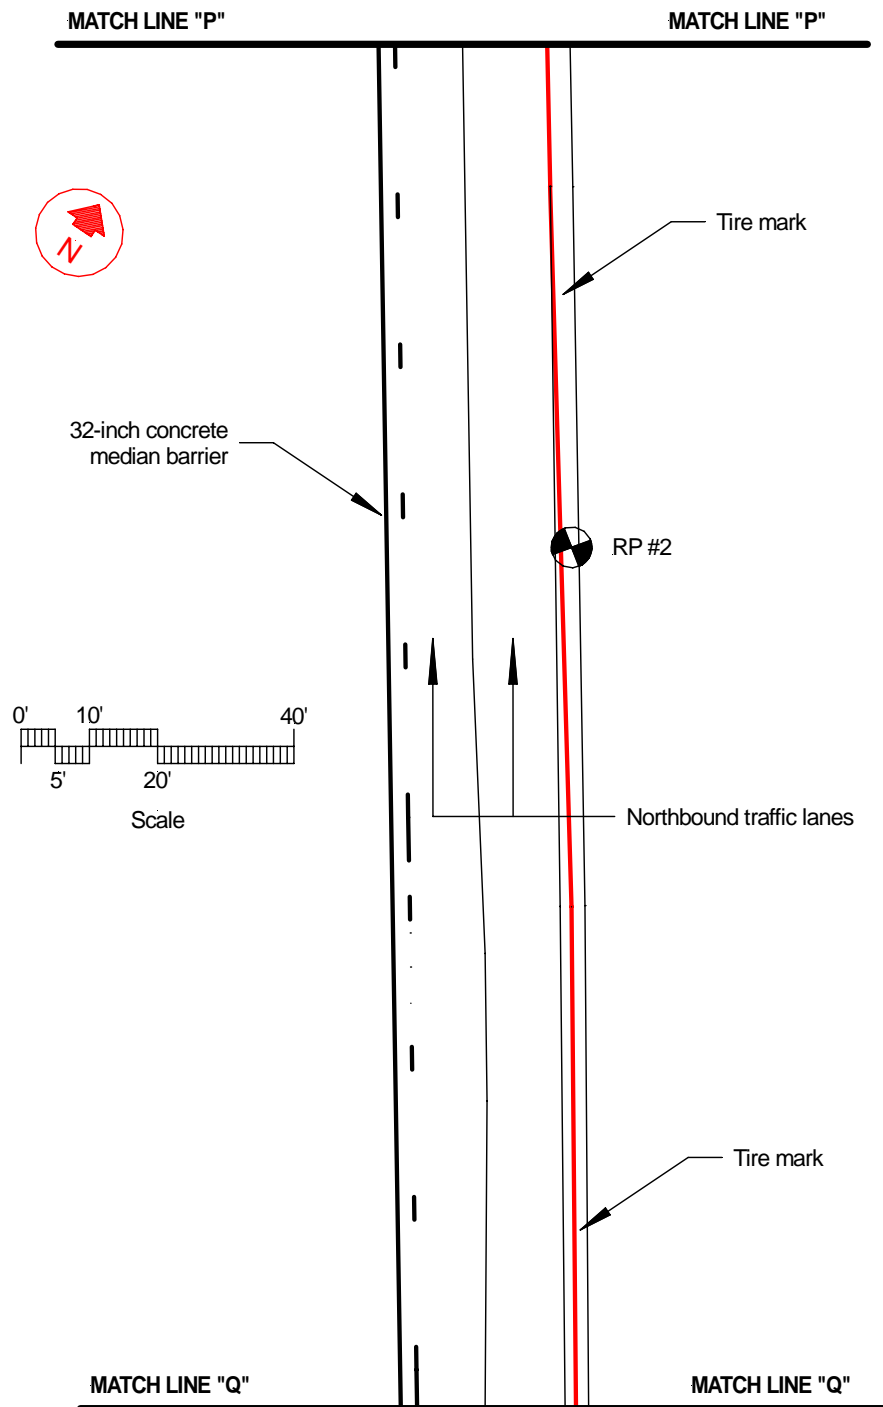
NTSB map of P-Q pavement markings and roadway evidence.
